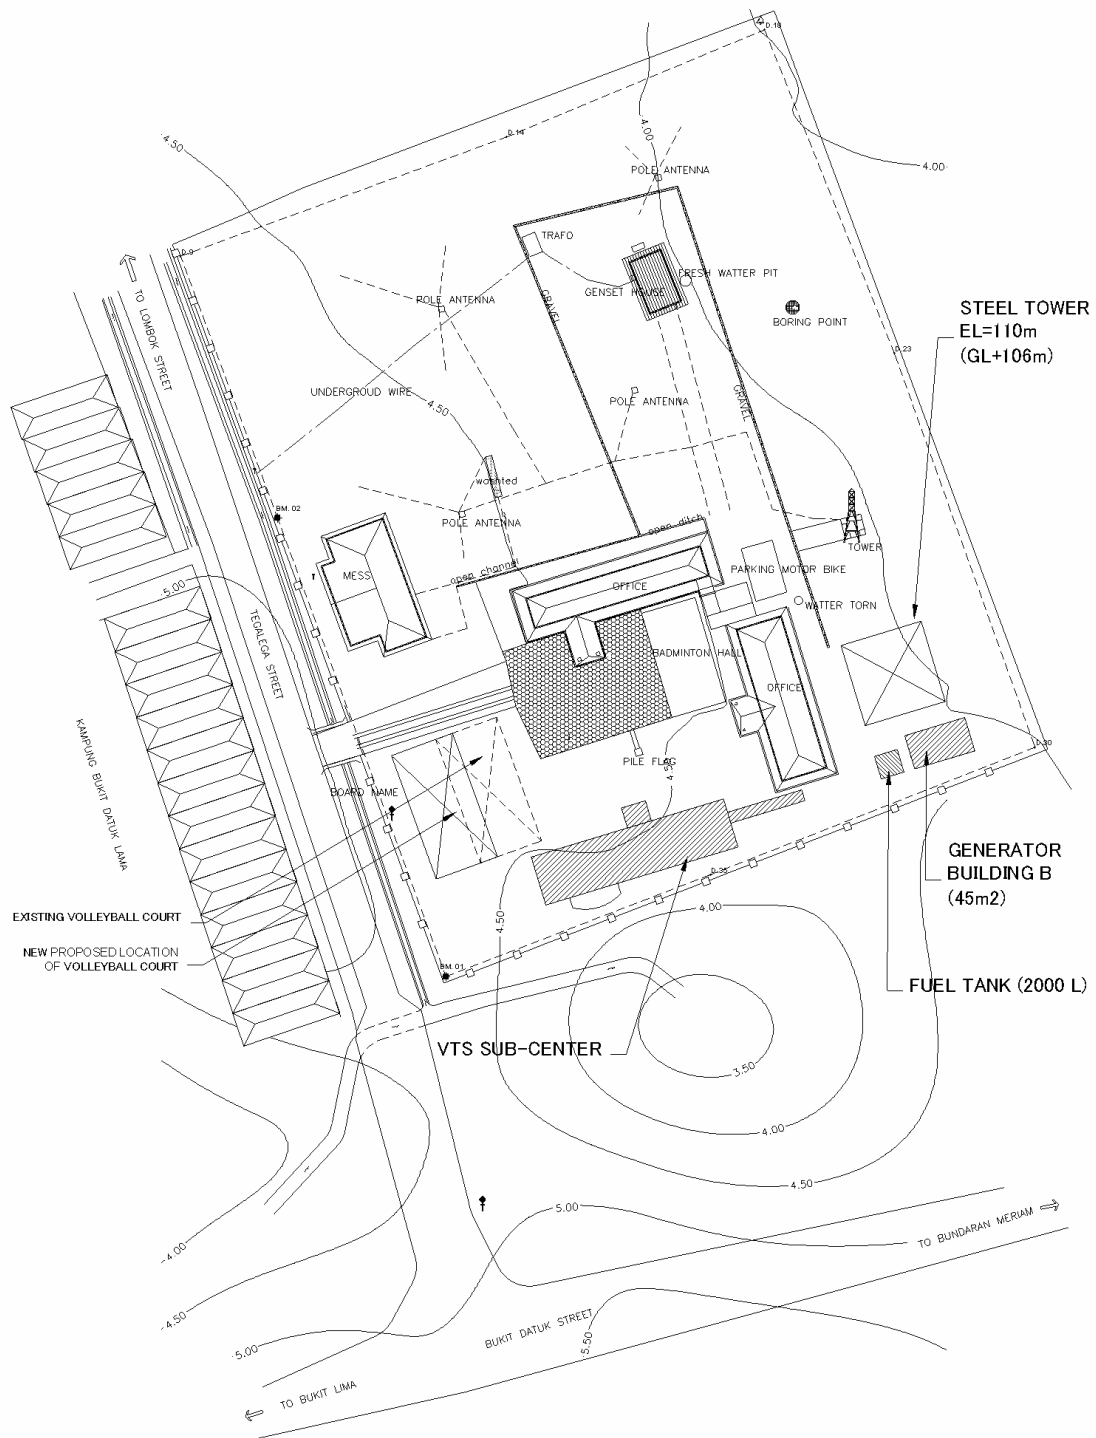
Plot Plan of Facilities (6) Tanjung Parit
